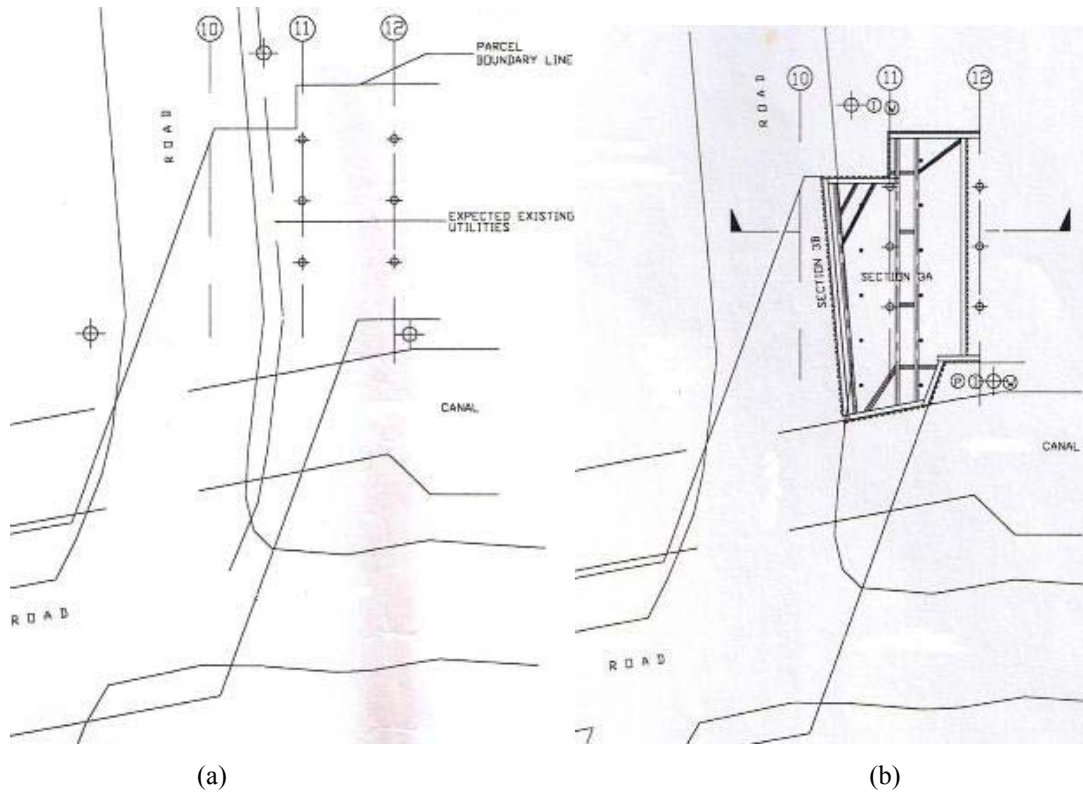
(a) Existing features and land parcel line; (b) planned excavation steelwork (first phase)
